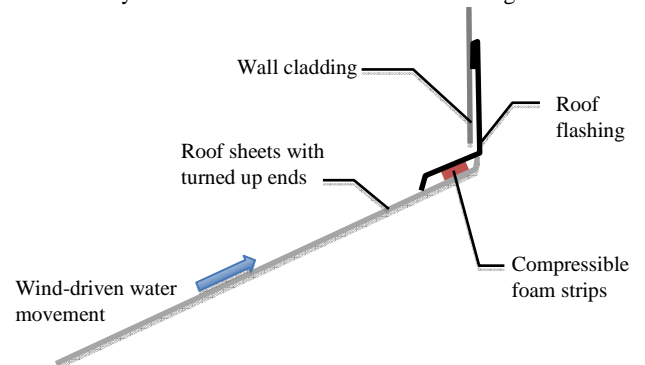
Compressible foam strip under apron flashing between second storey wall and first storey roof
